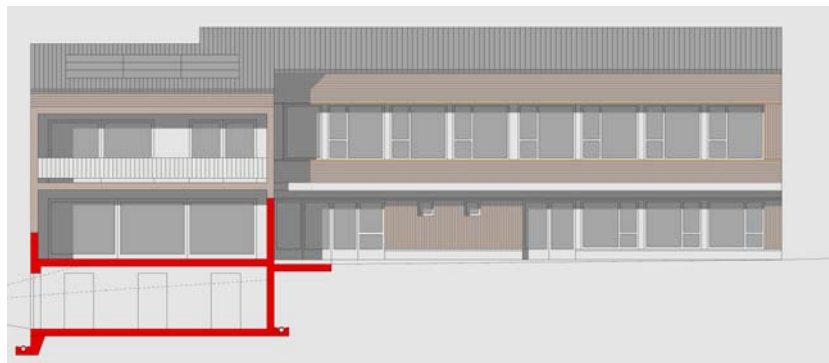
View from south of renovated caretakers apartment (left) and school building (right) (source: Bruno Thoma)
